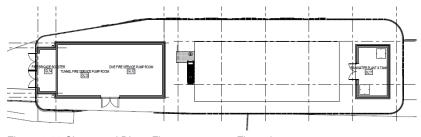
Chatswood Dive - Fire pump room - Floor plan
